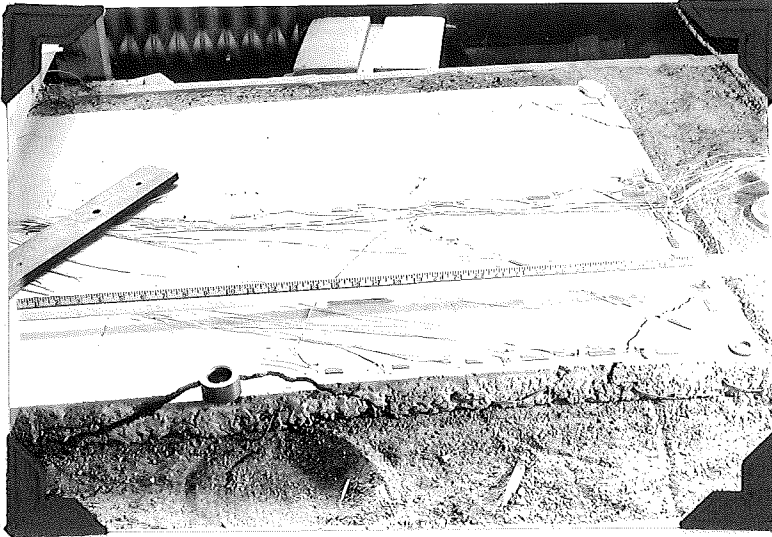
End of slab showing failure due to single wheel at corner in right foreground, corner break from tandem loading in right background, and edge break caused by semi-circular loading area in left foreground.
